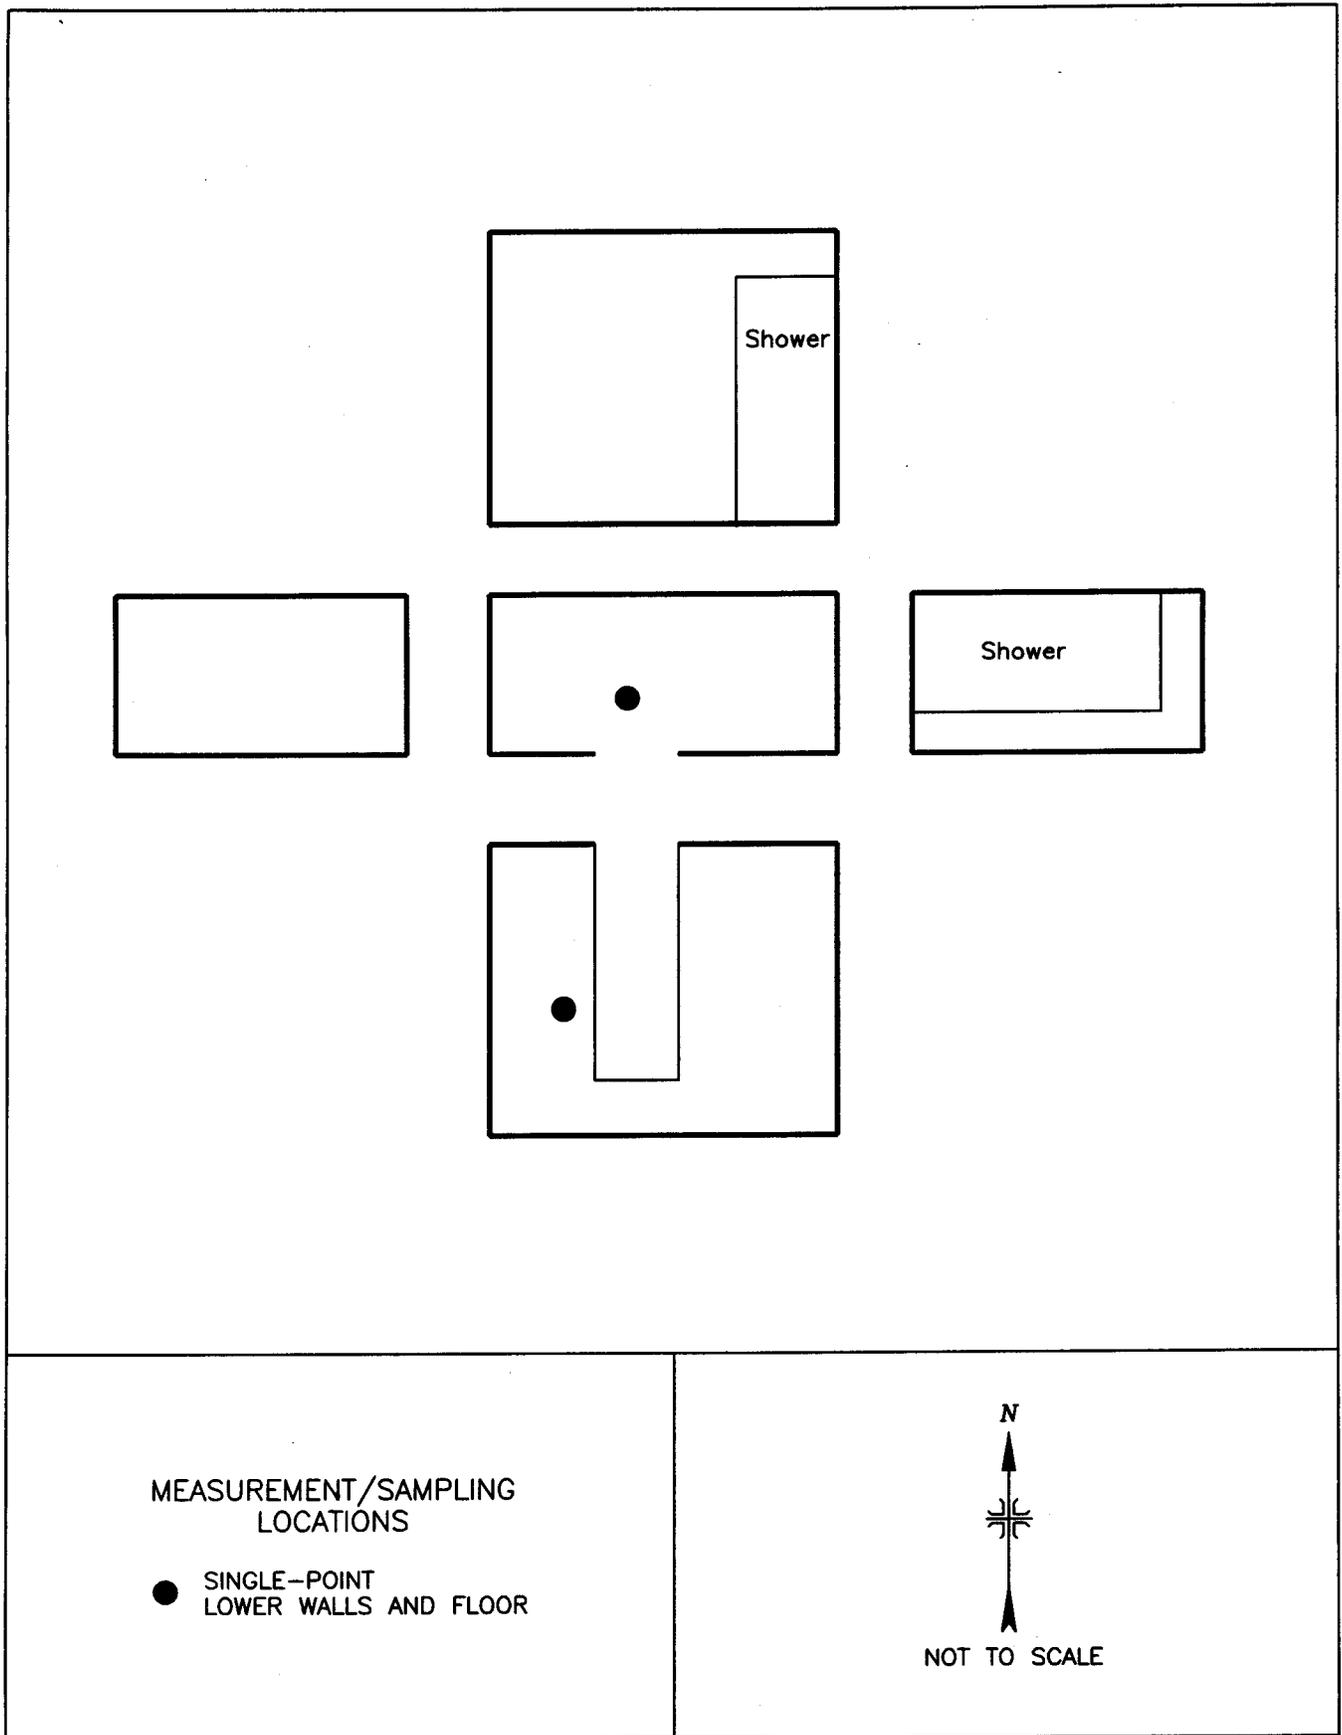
Building 4133, Restroom – Measurement and Sampling Locations
